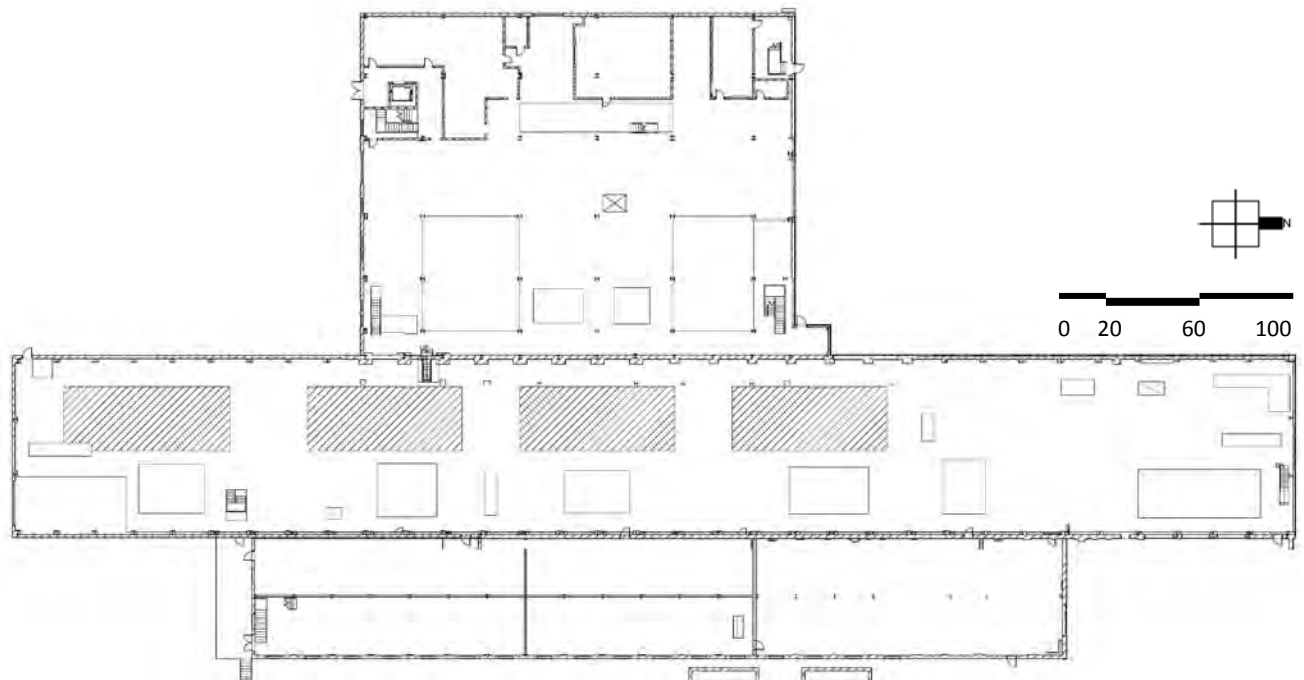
First Floor Plan. Alley Poyner Macchietto Architecture, 2014.
